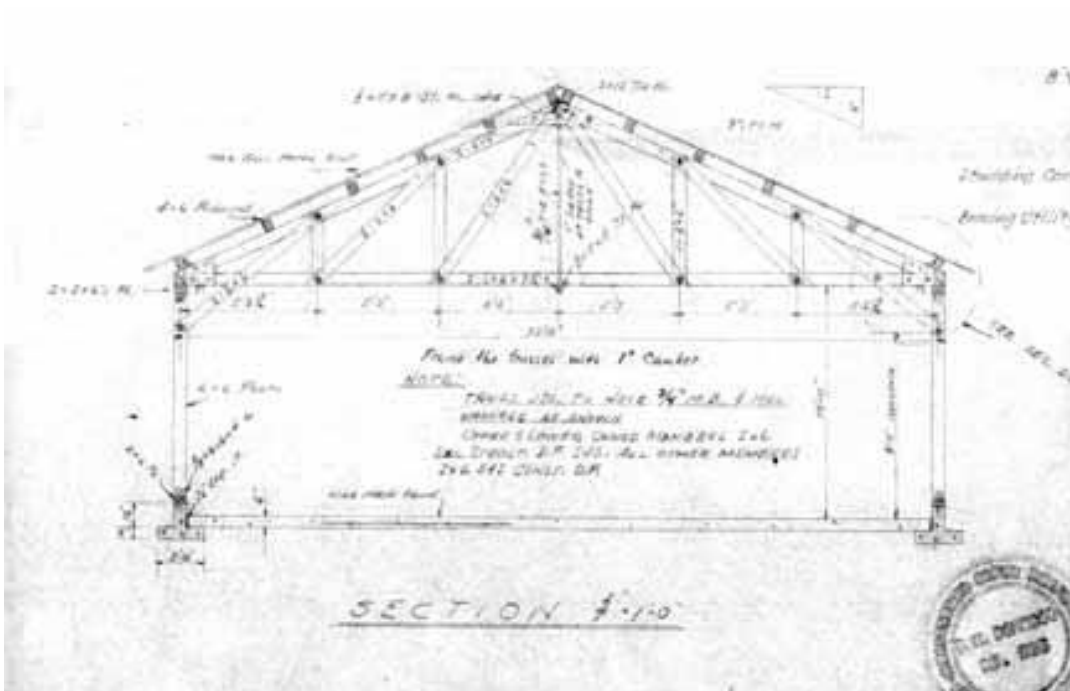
structural detail, sheet 1, Chemical Storage & Steam fitters shop building, Pacific Lumber Company, Drawing 11574m , "B" boiler room, 3.5.1957.
